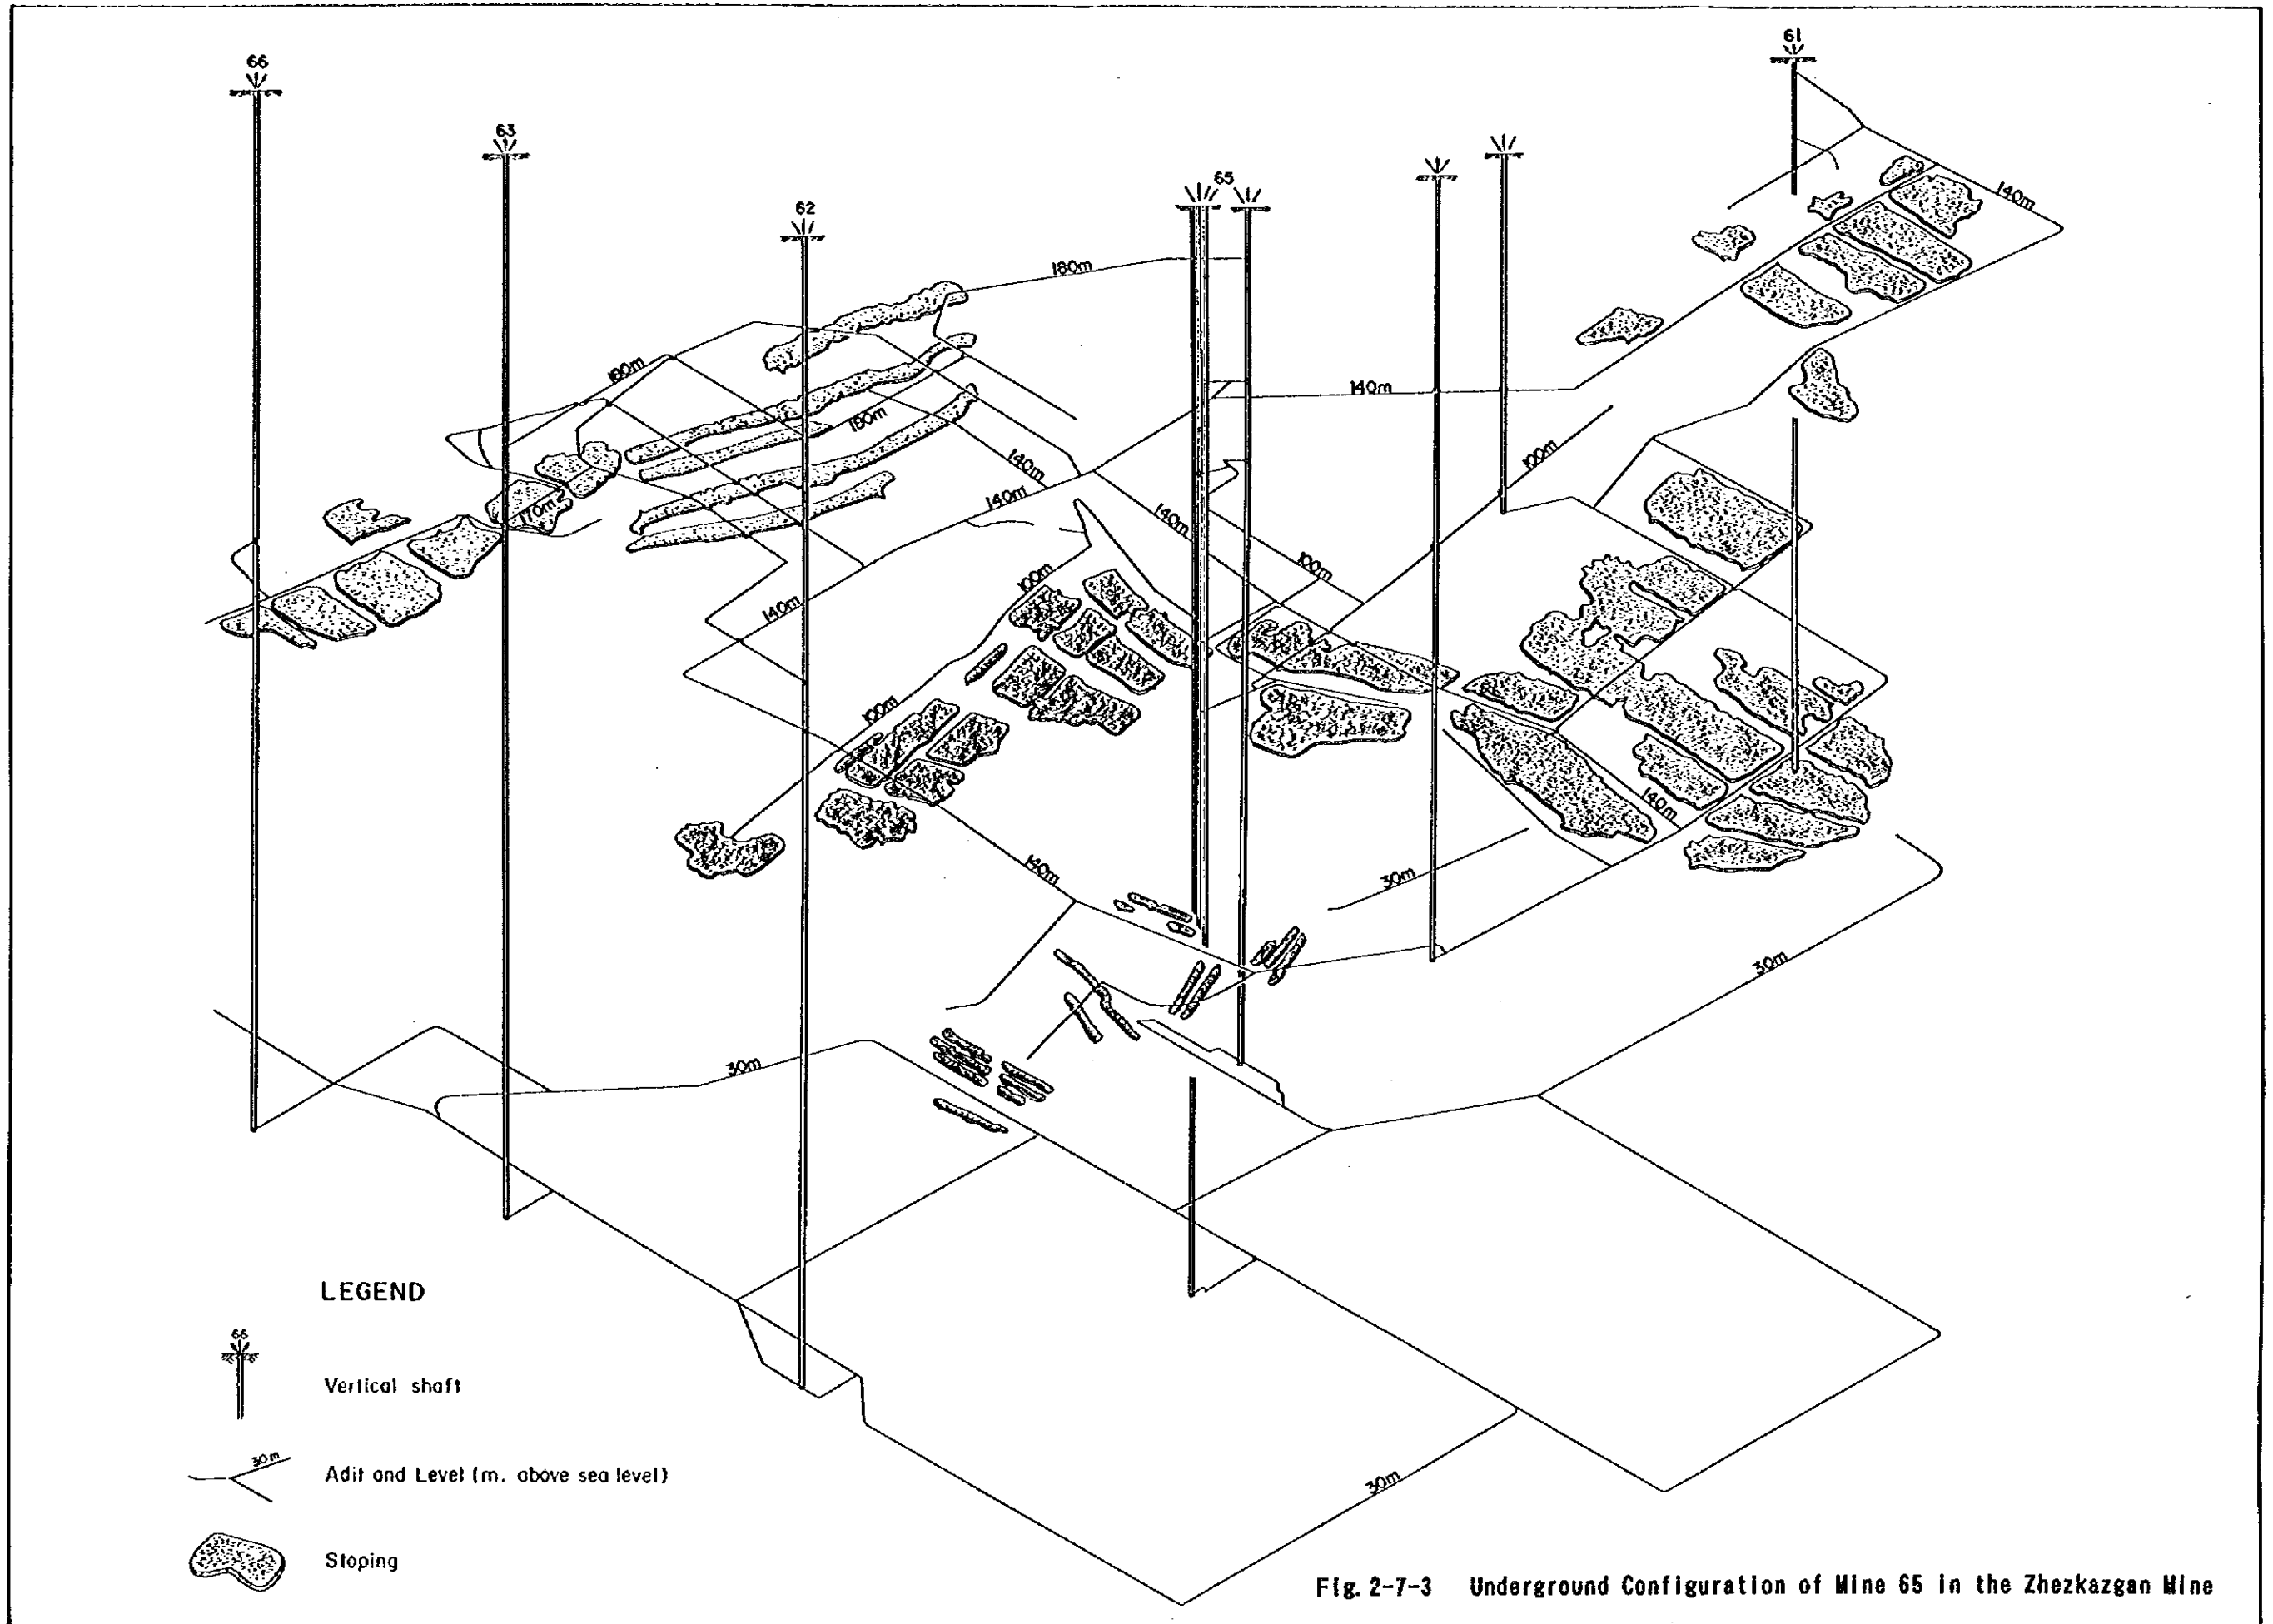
Underground Configuration of Mine 65 in the Zhezkazgan Mine
